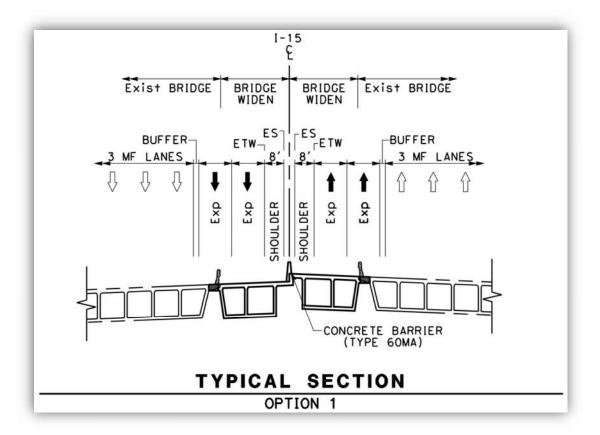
Lateral Separation of Bridge Structures - Option 1
